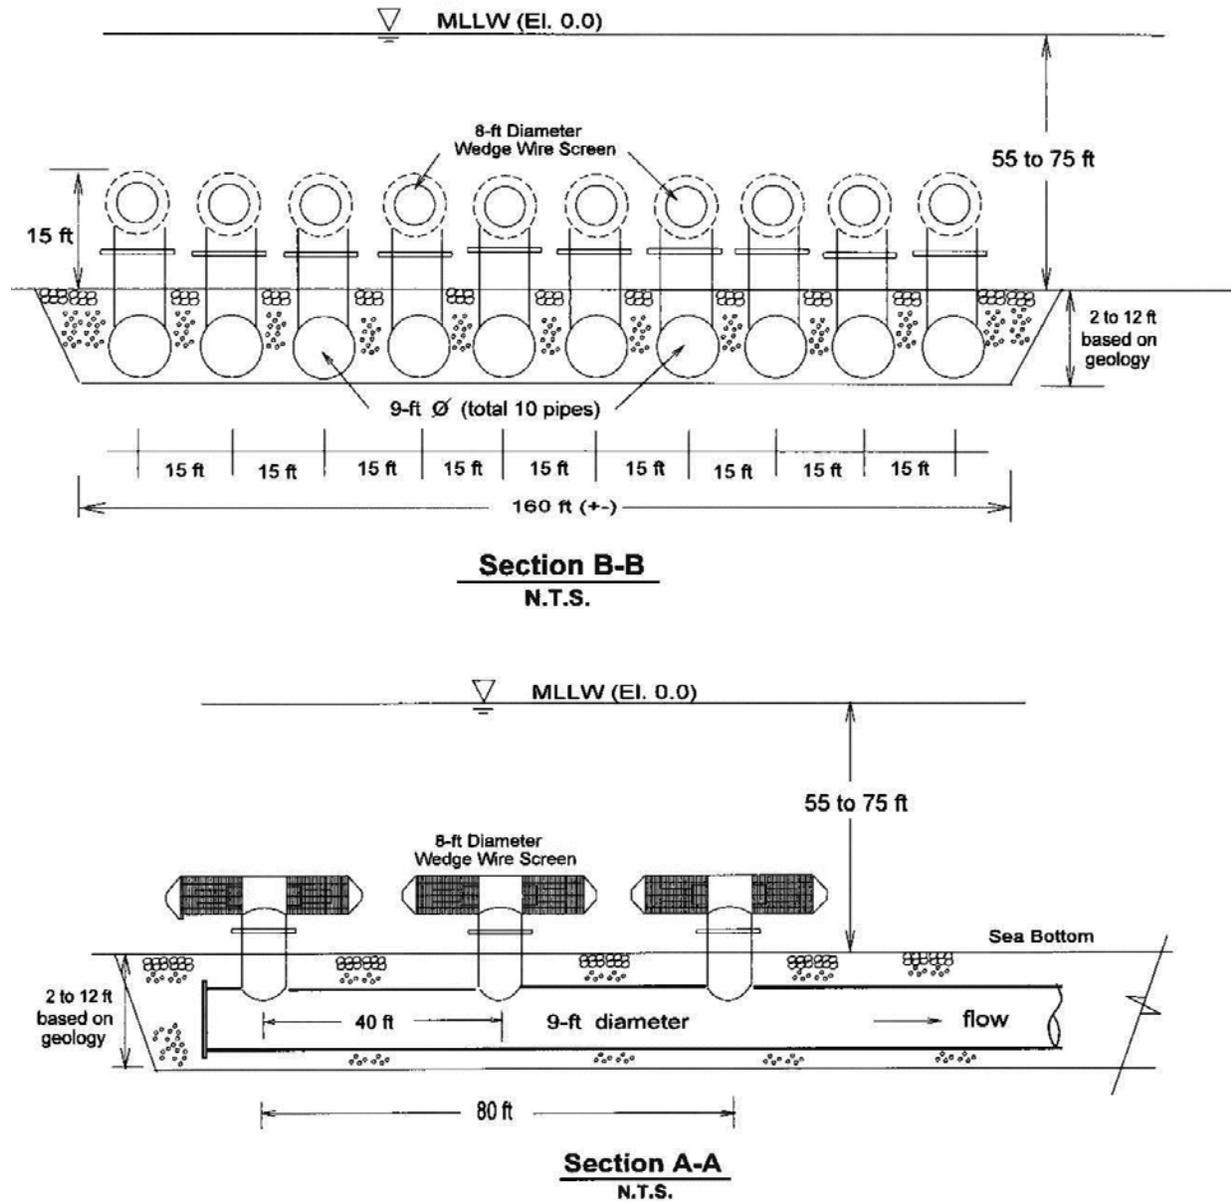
DCPP 6-mm-Slot Wedge Wire Screen Intake Assembly (Sectional Views)
